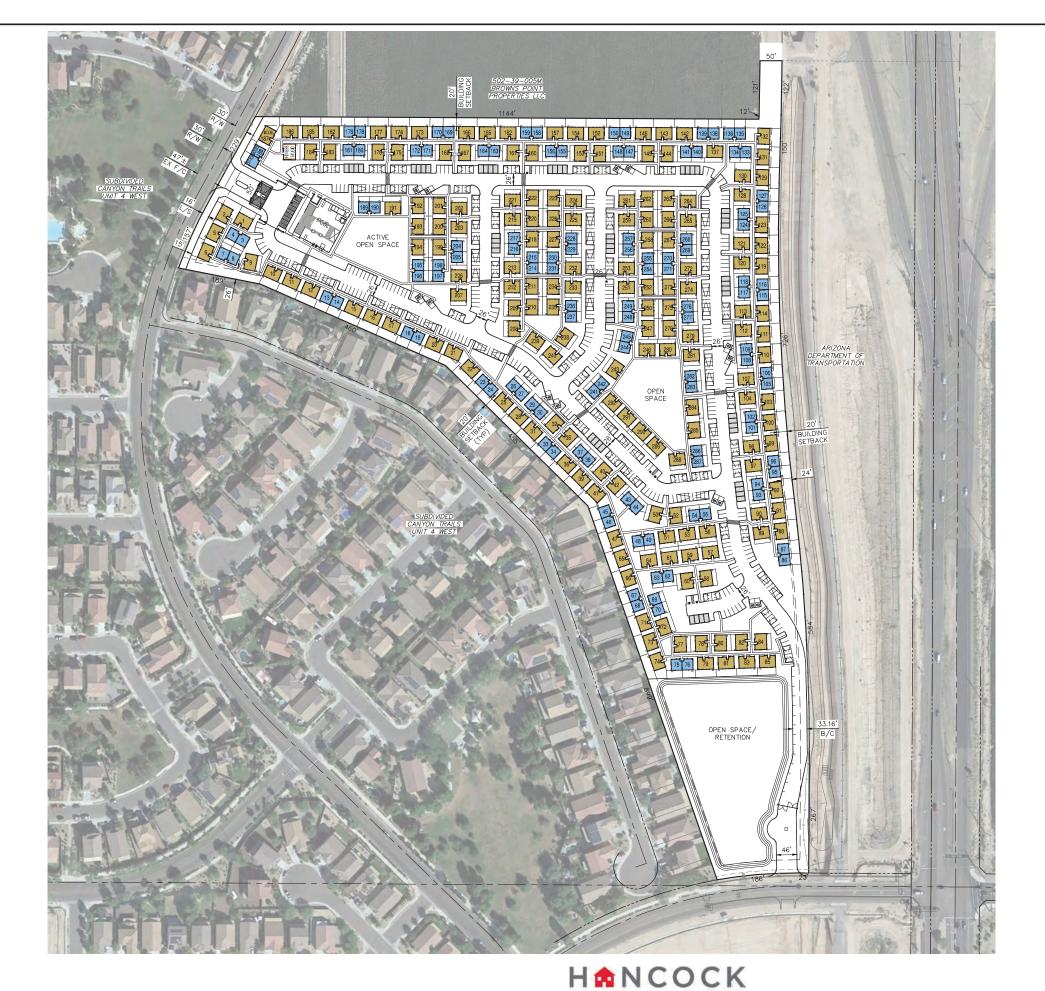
# Exhibit F Hancock Communities at Canyon Trails PAD Conceptual Site Plans
